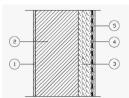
Inside heat insulation scheme, 1exterior plaster, 2 exterior wall, 3 PUR heat insulation, 4 drainage plane, 5 drywall.
